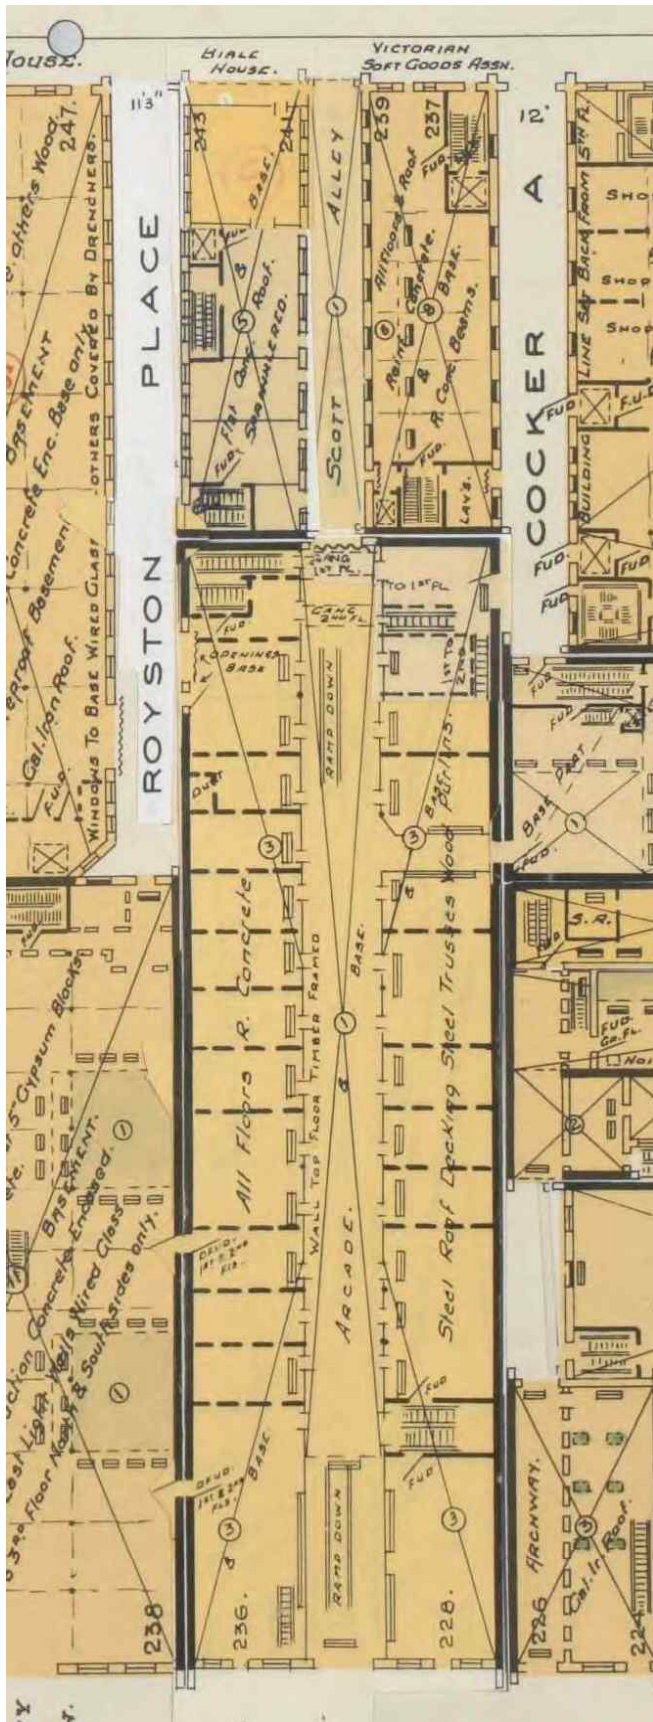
Mahstedt fire insurance plan, Plan 12, 1948, updated c. 1961 to show the layout of the Port Phillip Arcade
